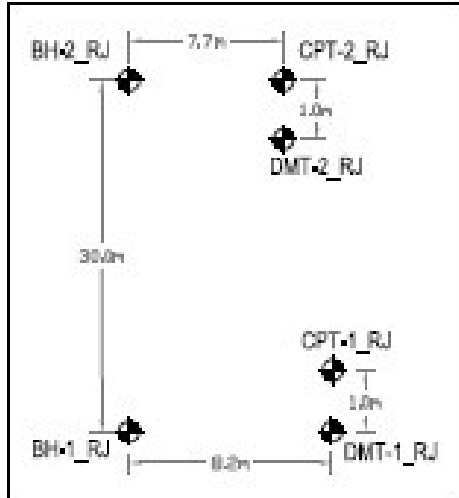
Schematic test location plan at Site-3 (RJ)
